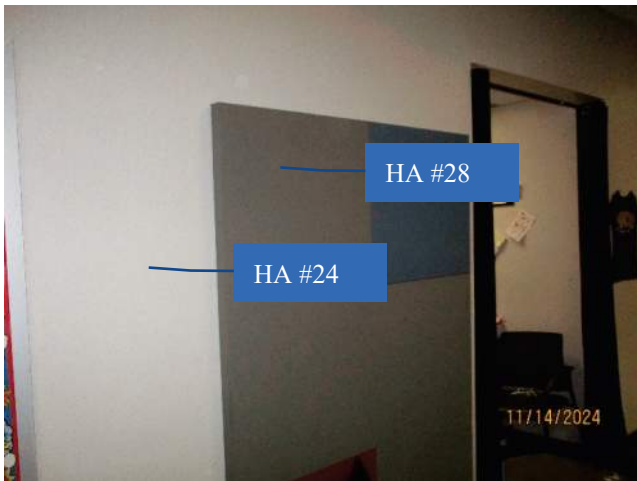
View of HA #24: Non-ACBM drywall wall system (eggshell) and HA #28: Non-ACBM button mastic associated with acoustic wall panels.
